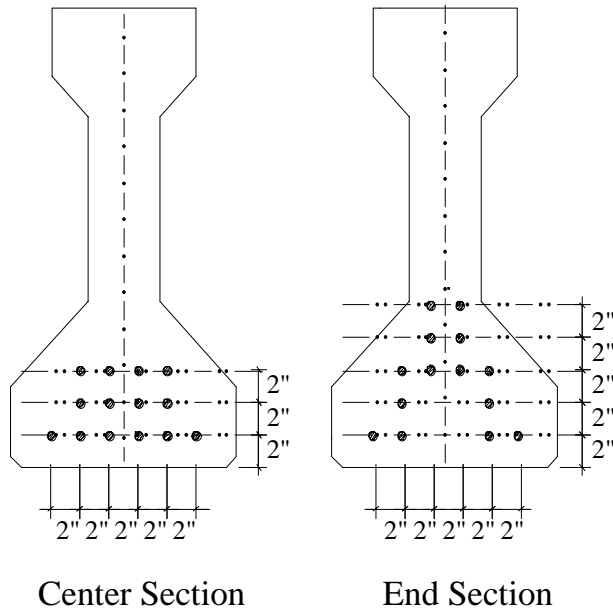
Type A I-beam Cross-section and Dimensions
